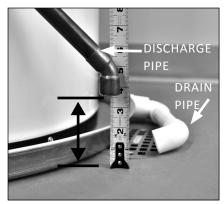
The end of the T&P Relief Valve discharge pipe must stop no more than six inches above a floor drain or terminate outside the building.
